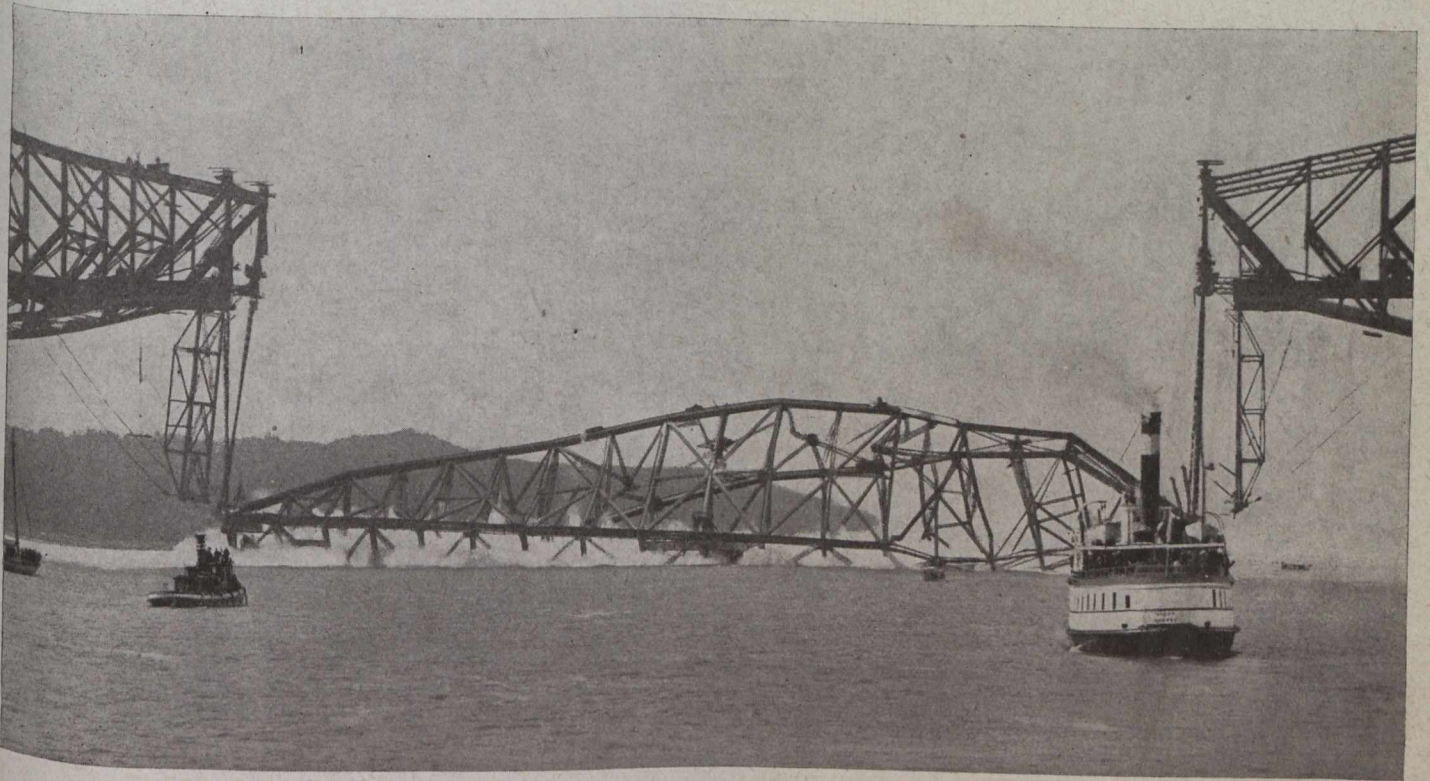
Taken Just as Centre Span is Falling into River After Failure of Casting on South Lifting Girder.
